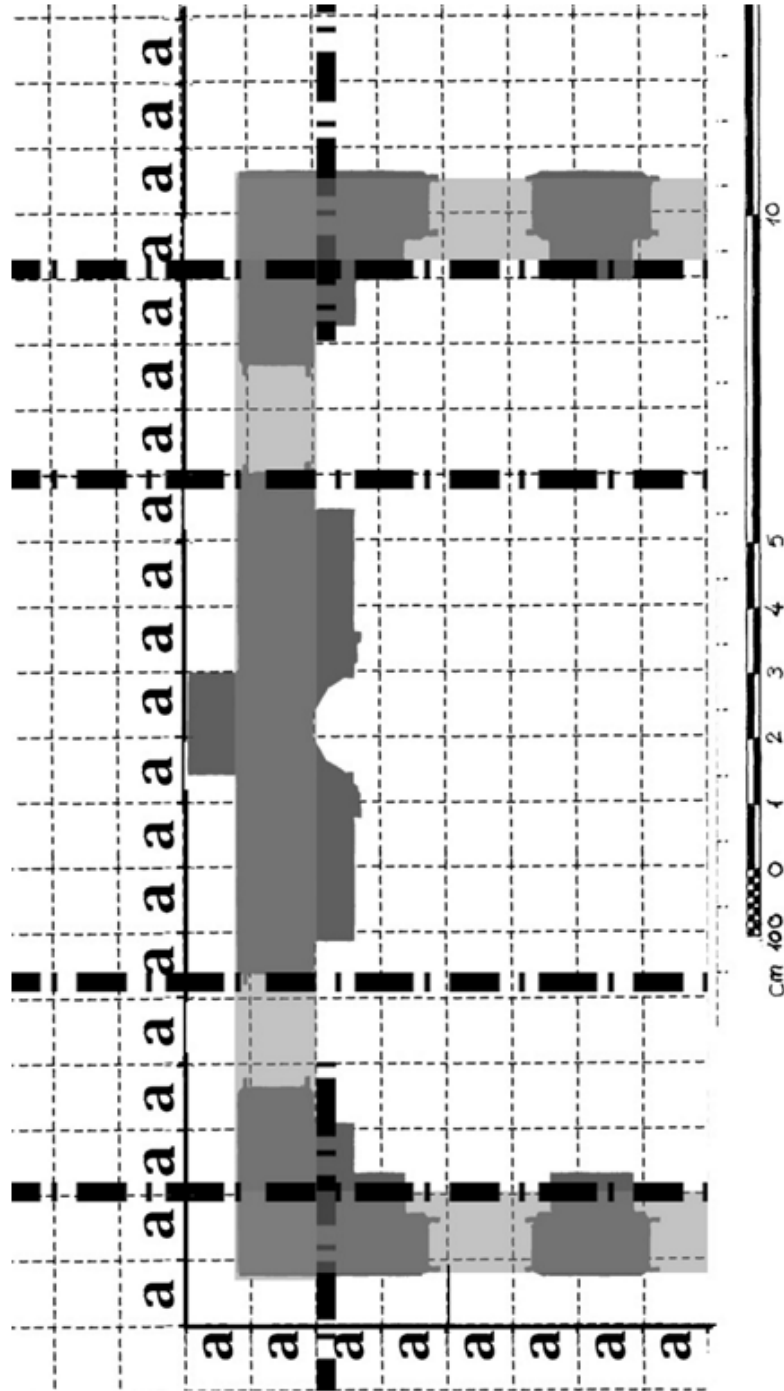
Rüstem Pasha Mosque floor plan detail A-A unit module foundation display
